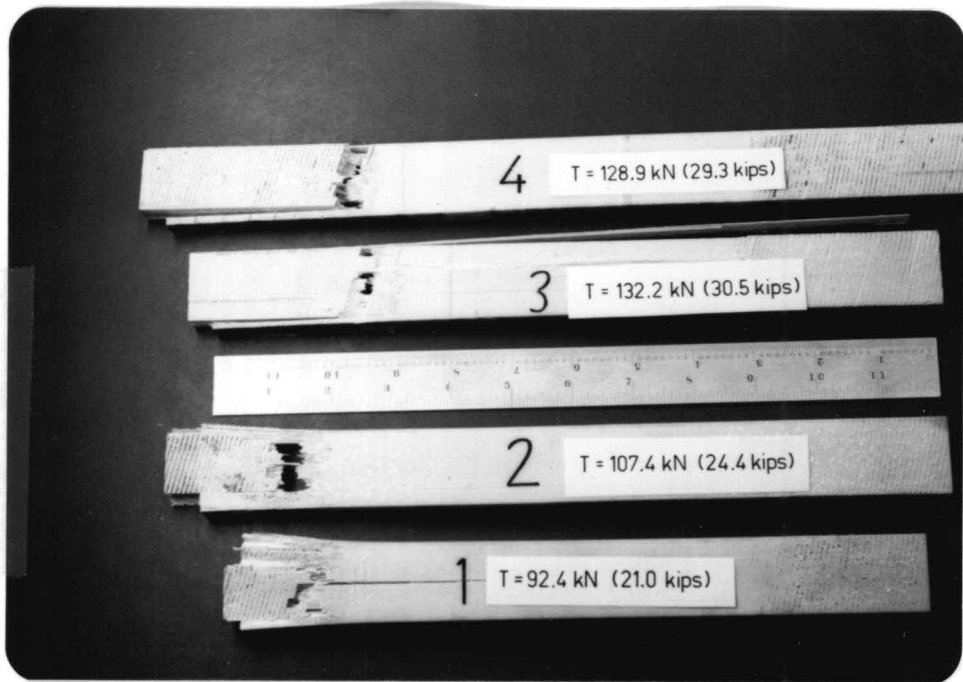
Fiberglass Bars Tested under Tension after Failure
